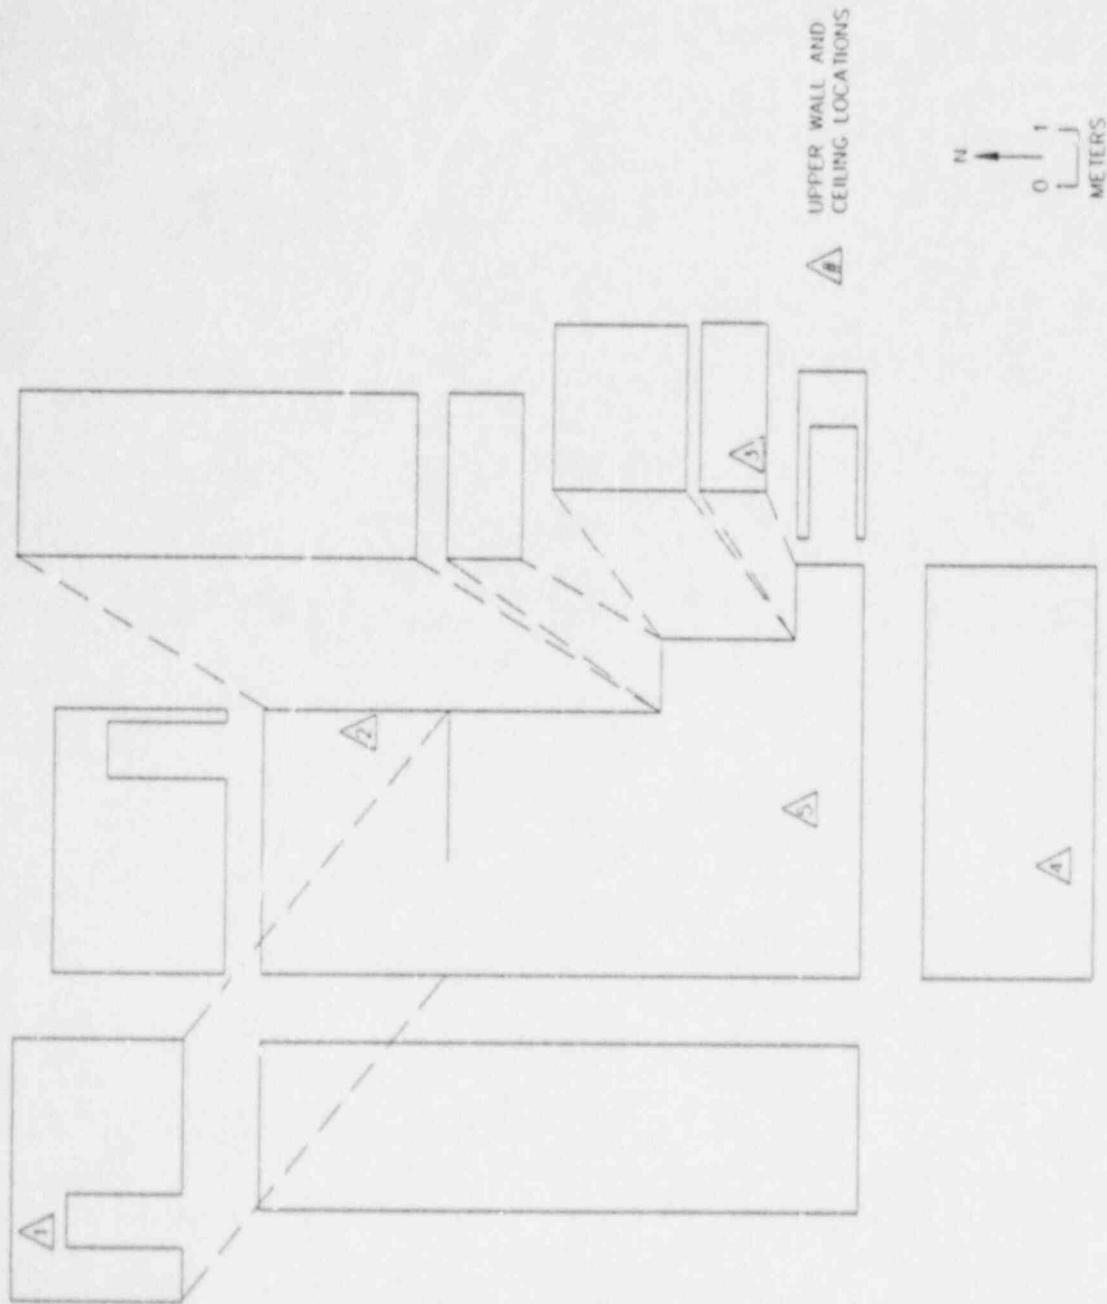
Men's Change Room Showing Locations of Upper Wall and Ceiling Single-point Measurements
